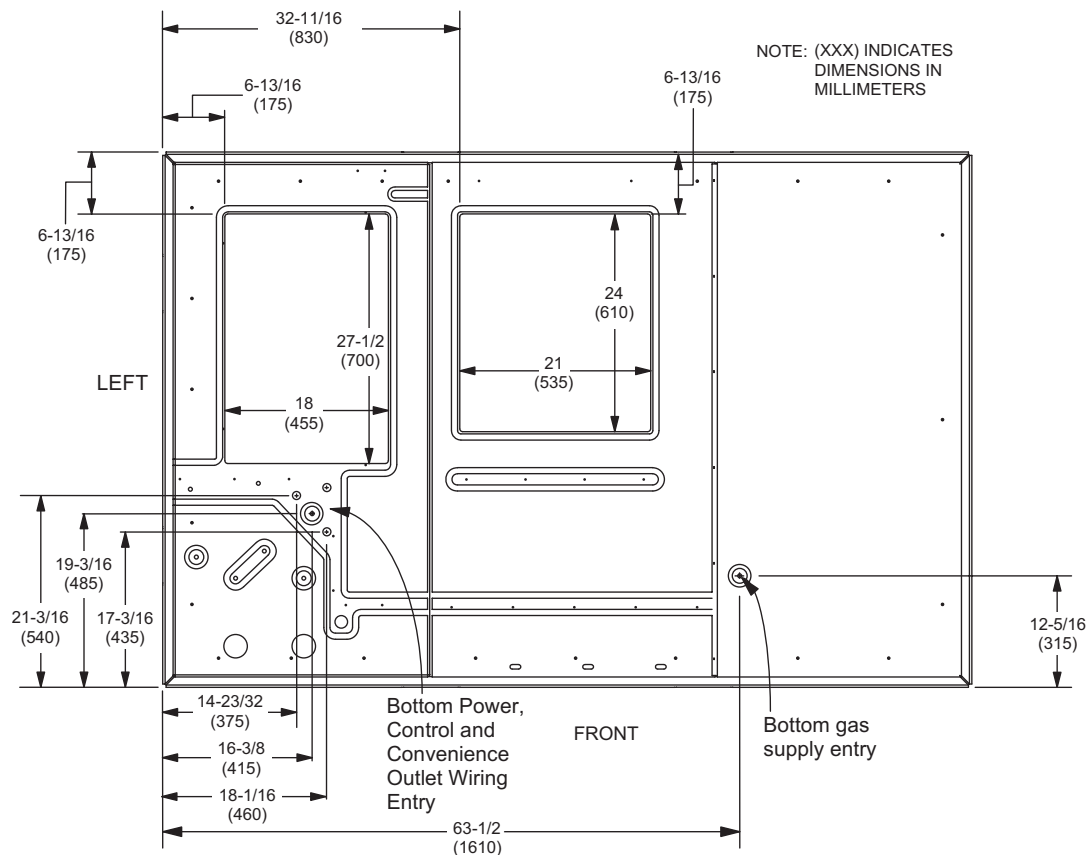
BOTTOM DUCT OPENINGS (FROM ABOVE)
